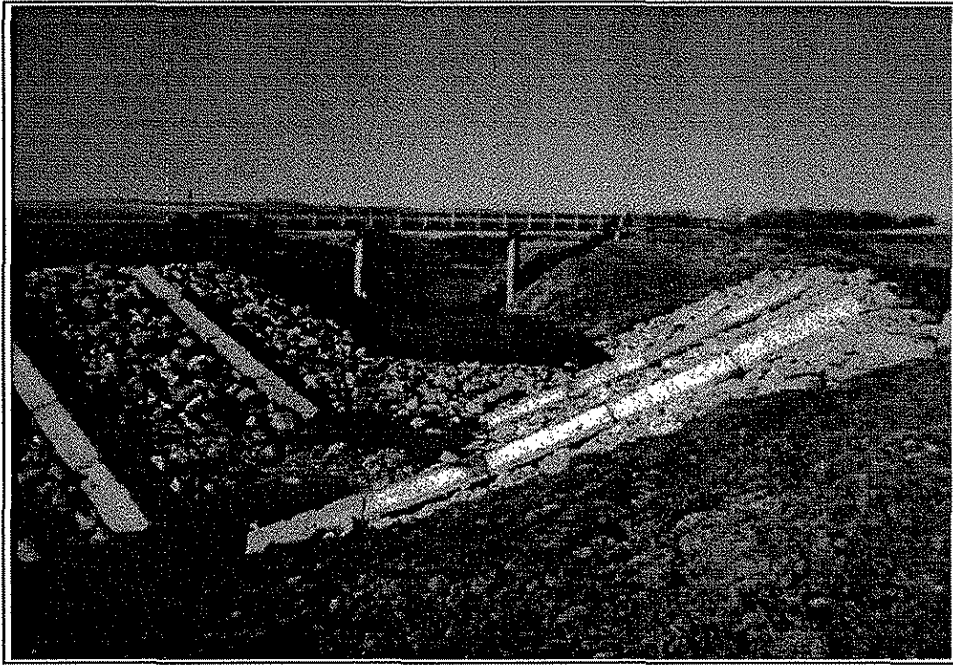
Double sheet pile/riprap structure, Little Walnut Creek, M47 bridge, Pottawattamie County.
